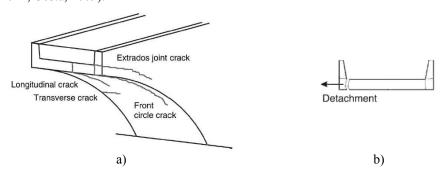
Defects in MAB (adapted from Proske and Gelder (2009)): (a) MAB cracks; (b) Spandrel walls detachment
